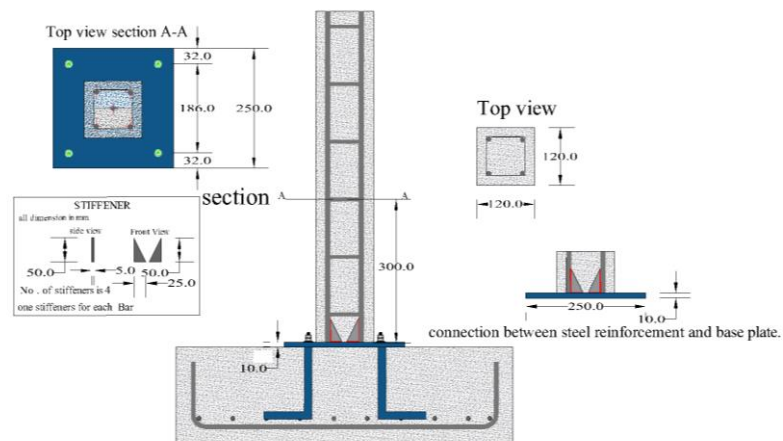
Details of steel reinforcement for the column- foundation bolted connection stiffeners type
